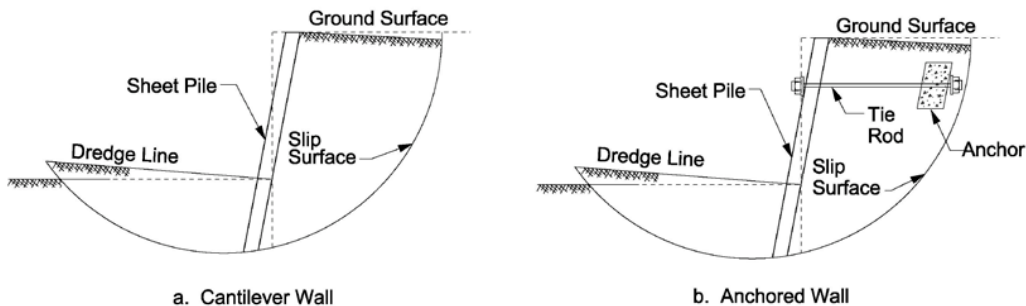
Deep Seated Failure of Non-Gravity Walls
